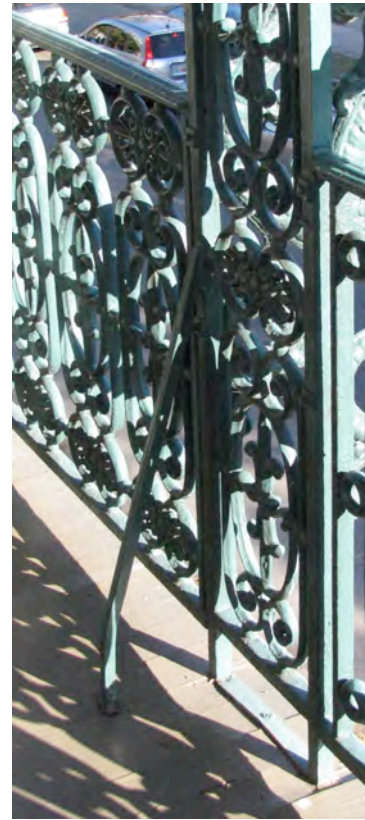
Support on the John Rutledge House balcony railing. Photo by author.
